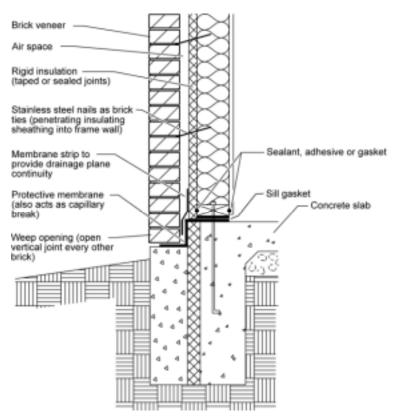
Brick Wall Construction Details Wood-Framed Wall with Brick Veneer, Mandatory Minimum R-13 Insulation
